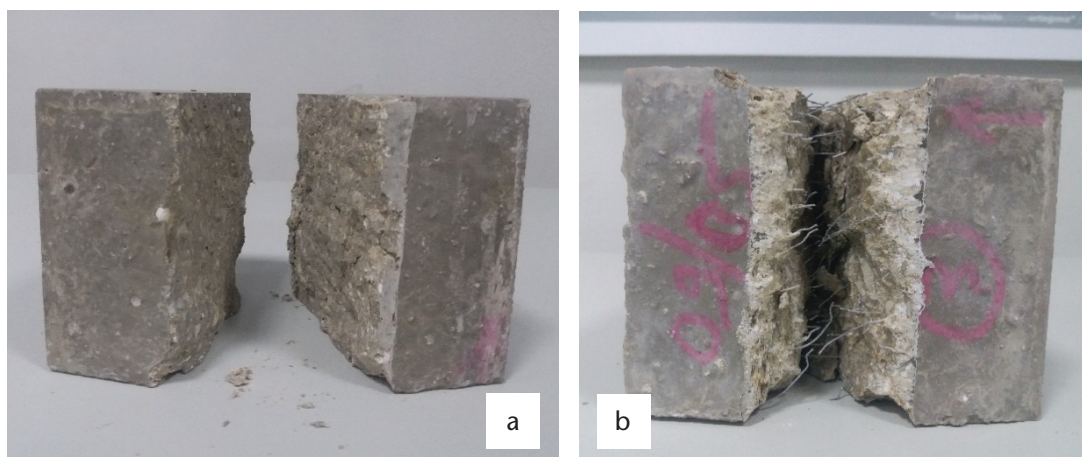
SCC mixture specimens after splitting tensile test a. Specimen of the control mixture b. Specimens of the L30 mixture.
